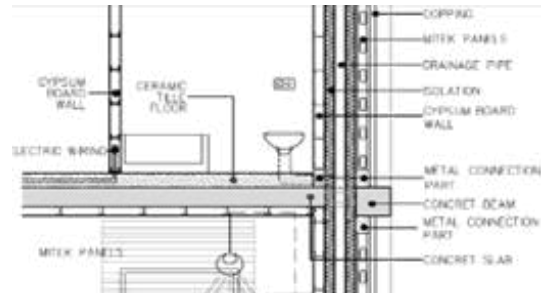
Infrastructure detail- Vertical piping run every 6 m. The horizontal pipes from the fixtures run in floor. Source: (Author 2016)
